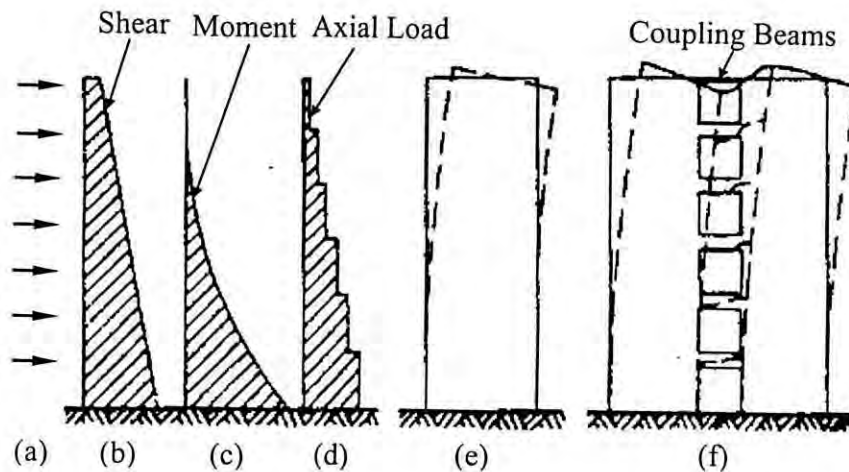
(a) Lateral Loads. (b) Shear Diagram. (c) Moment Diagram. (d) Axial Loads. (e) Isolated Wall. (f) Coupled Wall (Ferguson, 1987).
